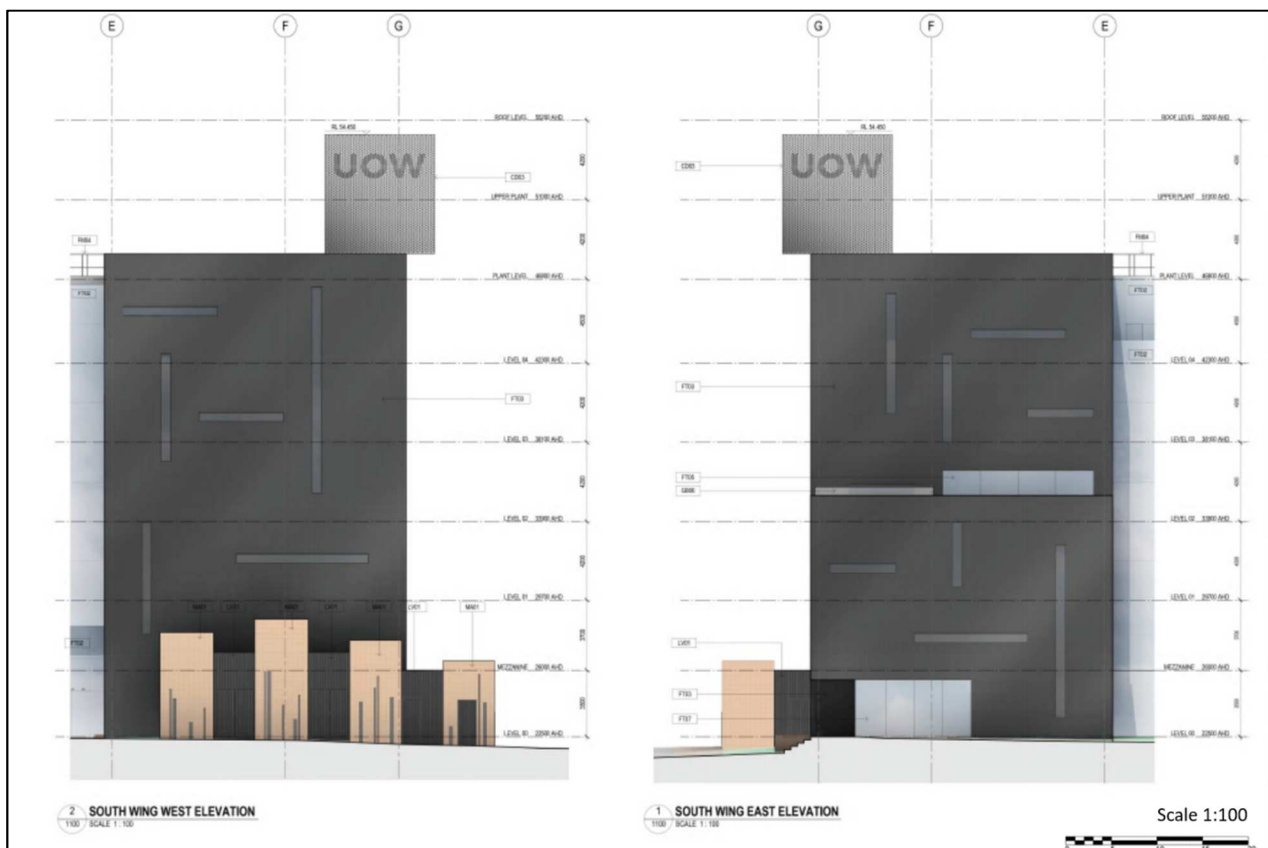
MLS Building south wing east and west elevation (Source: Applicant's RtS)
